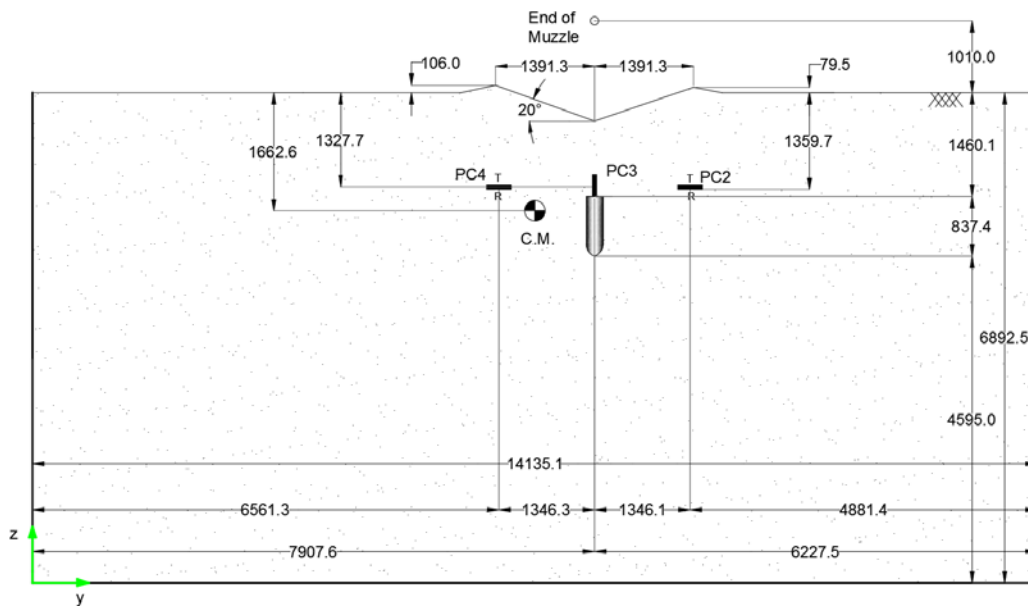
Schematic sketches of the penetrated projectile in test 3b and the formed crater: plan view (dimensions in mm)
